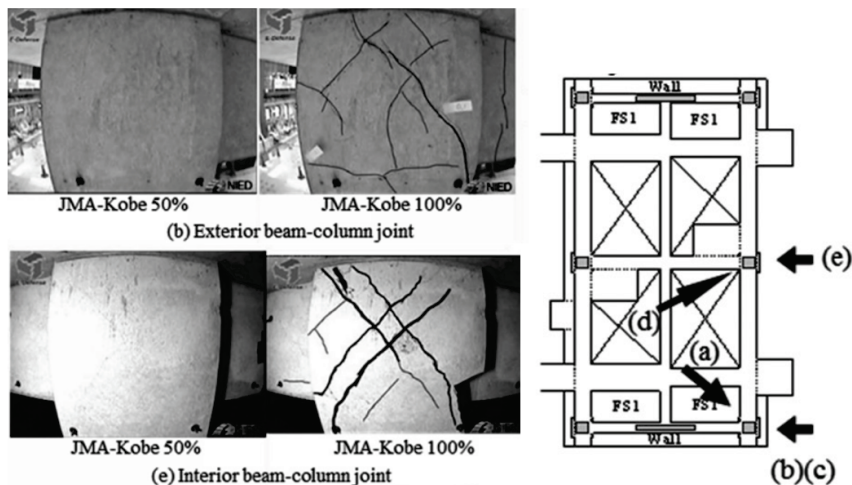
Observed joint damage at the second floor level (adapted from Nagae et al., 2015).
